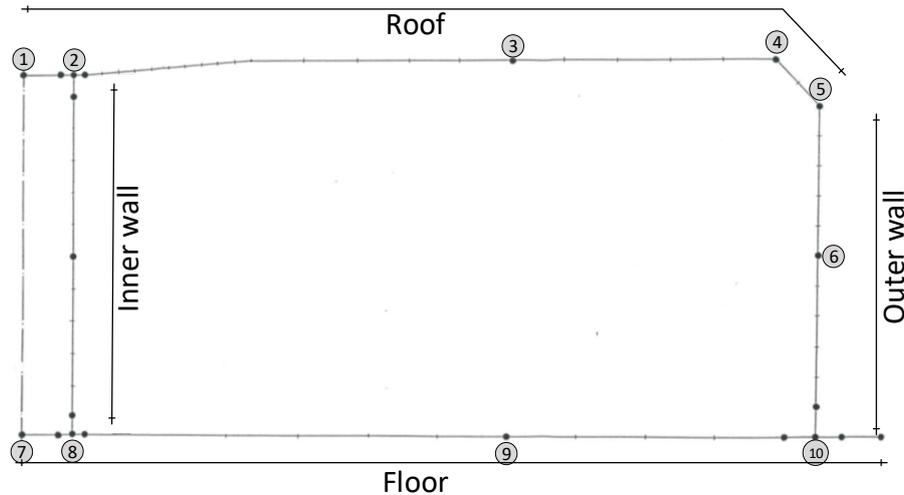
, ORIGINAL DESIGN WIJKER TUNNEL
